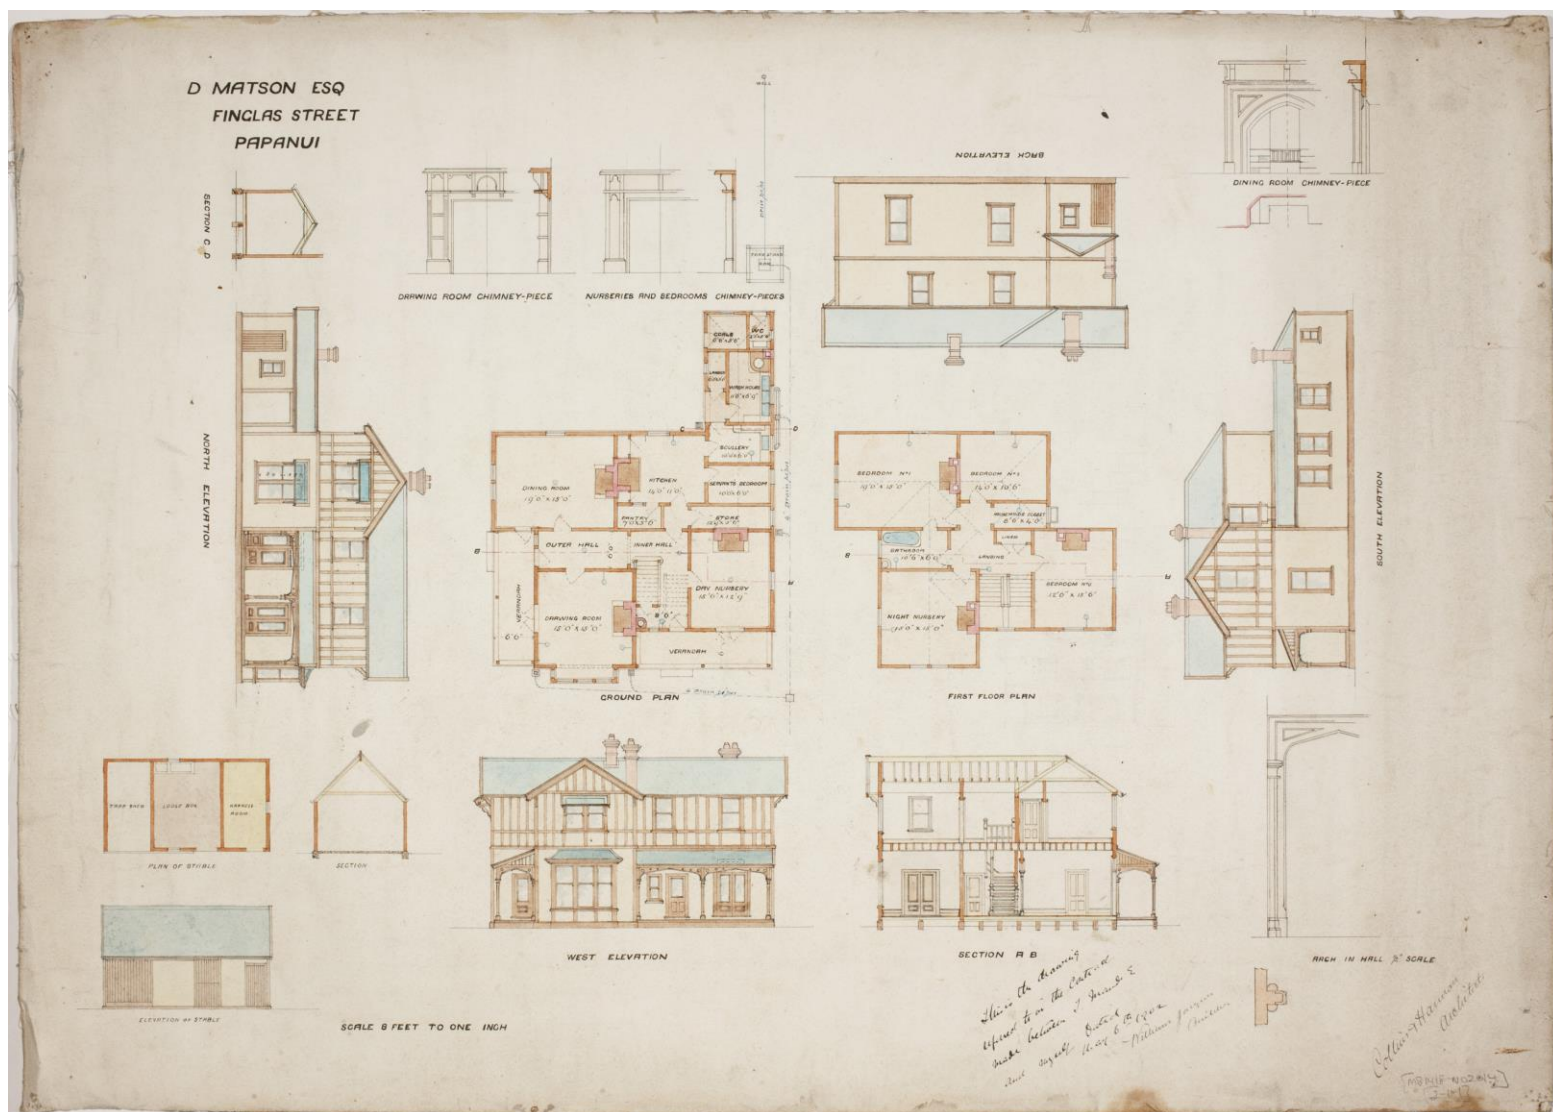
Collins and Harman, D. Matson, Esq., Finglas Street, Papanui, plans, elevations, sections and details (1902).
